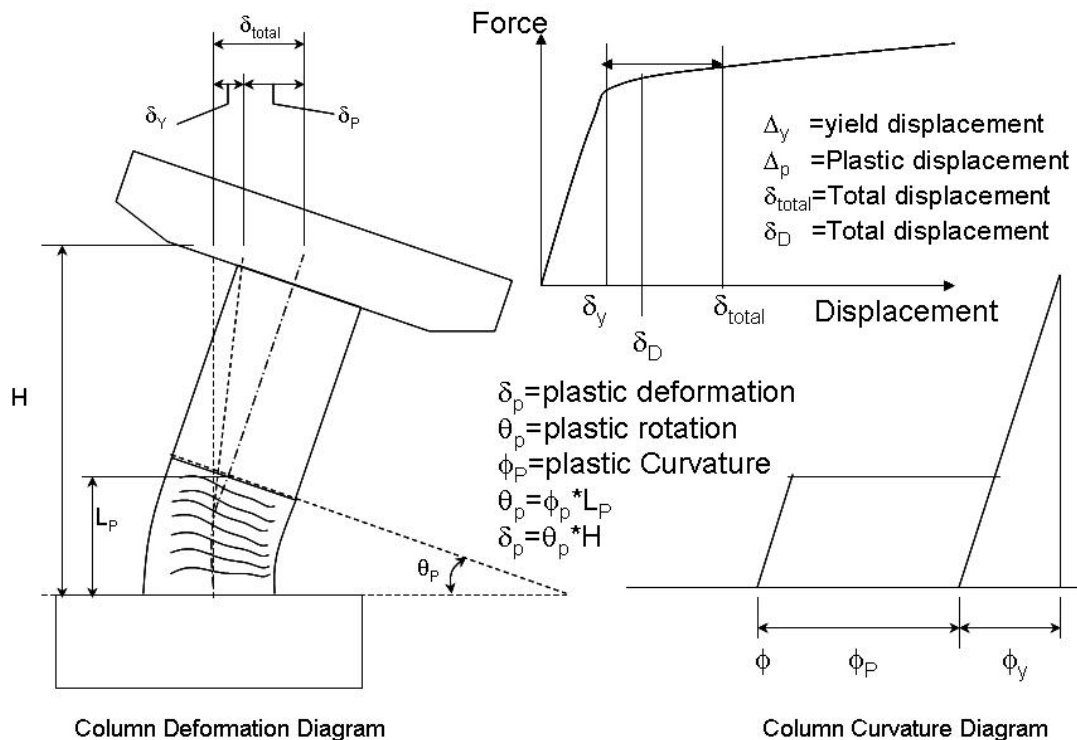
b - Idealized Cantilever Column Plastic Hinging Force-Displacement
